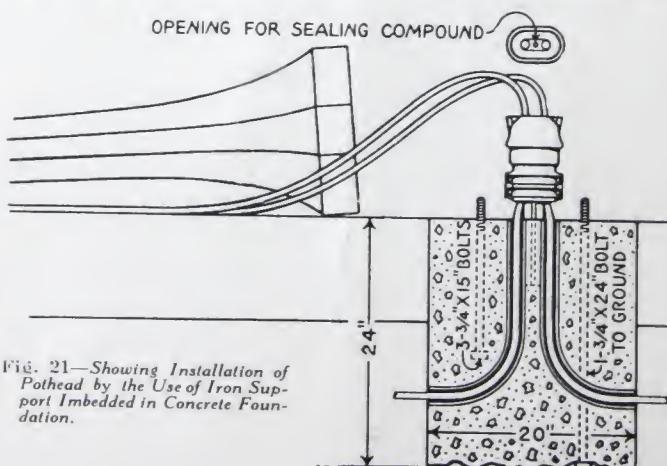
Showing Installation of Pothead by the Use of Iron Support Imbedded in Concrete Foundation.
